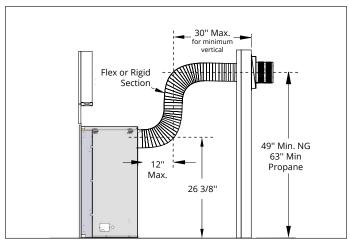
d Rear Vented, wall mounted Multi-elbow termination installation for NG or Propane. Installation must comply with the Venting Graph for Rear vent, wall mounted terminations, Figure 15 or 15a.
